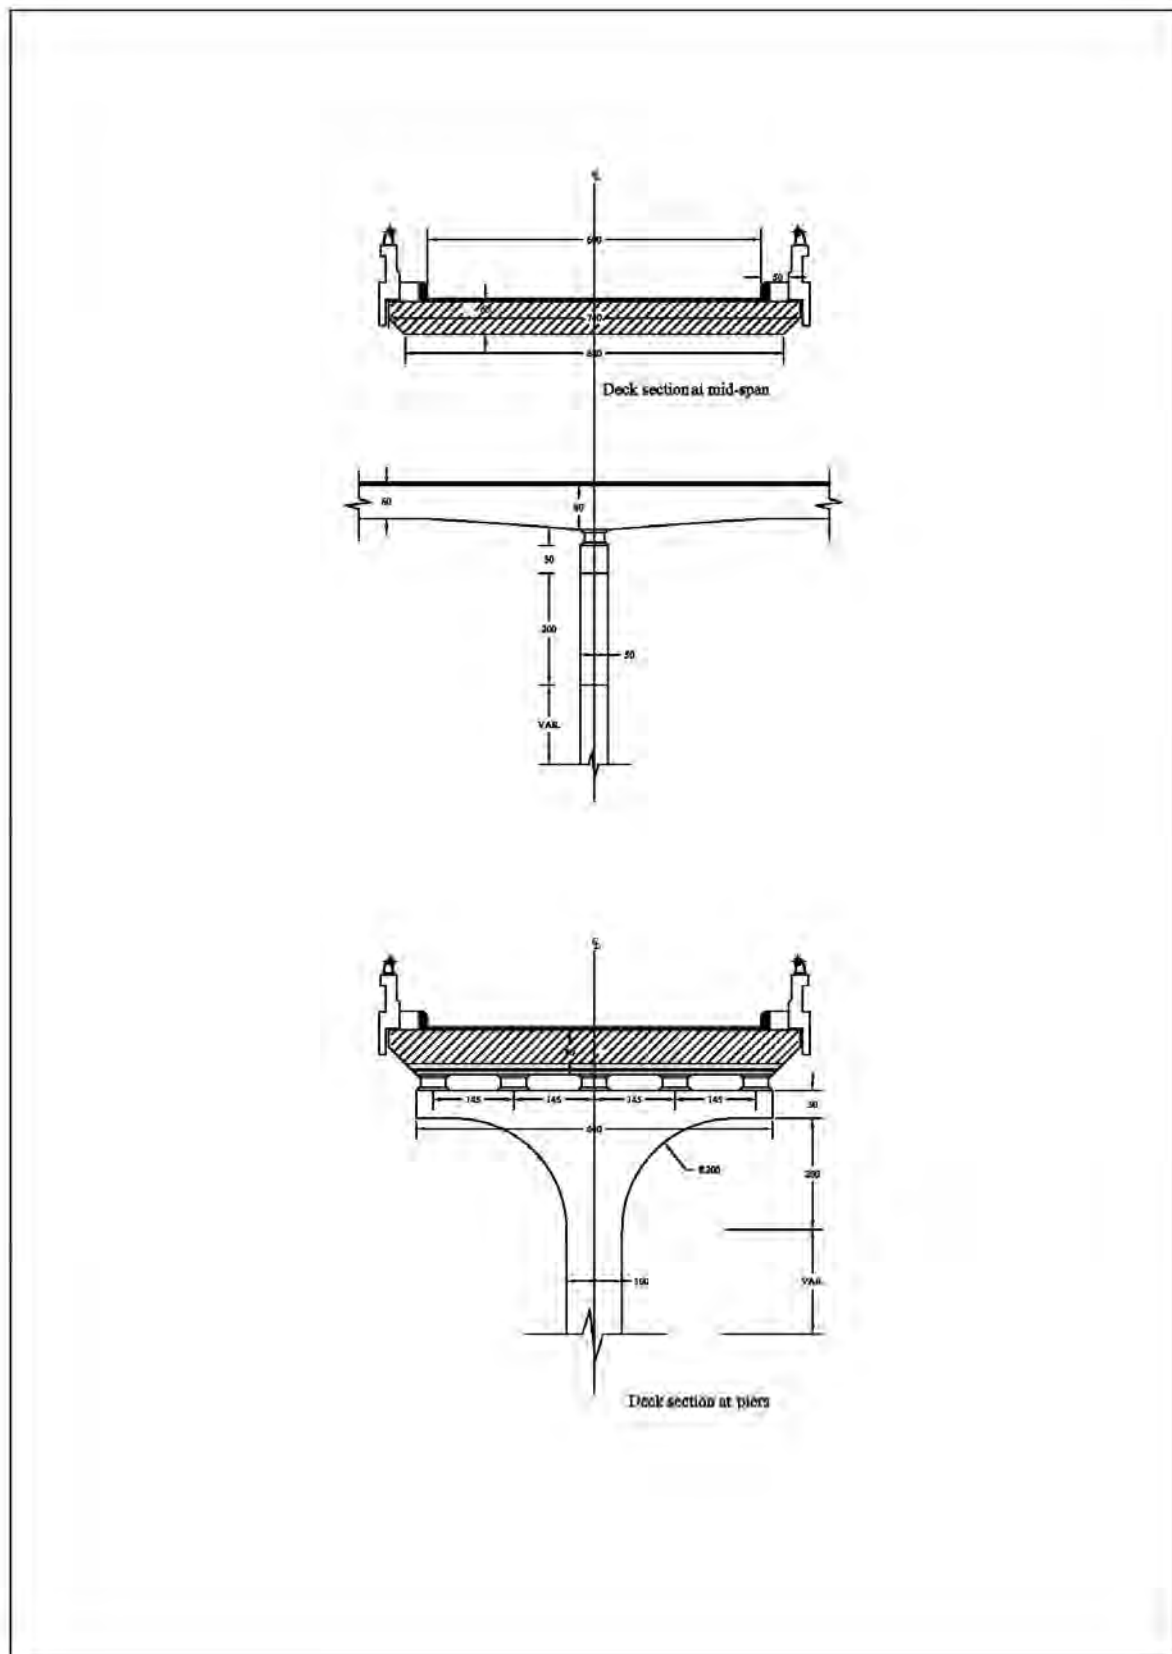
d General Plan of the Proposed Karantina Westbound Ramp
